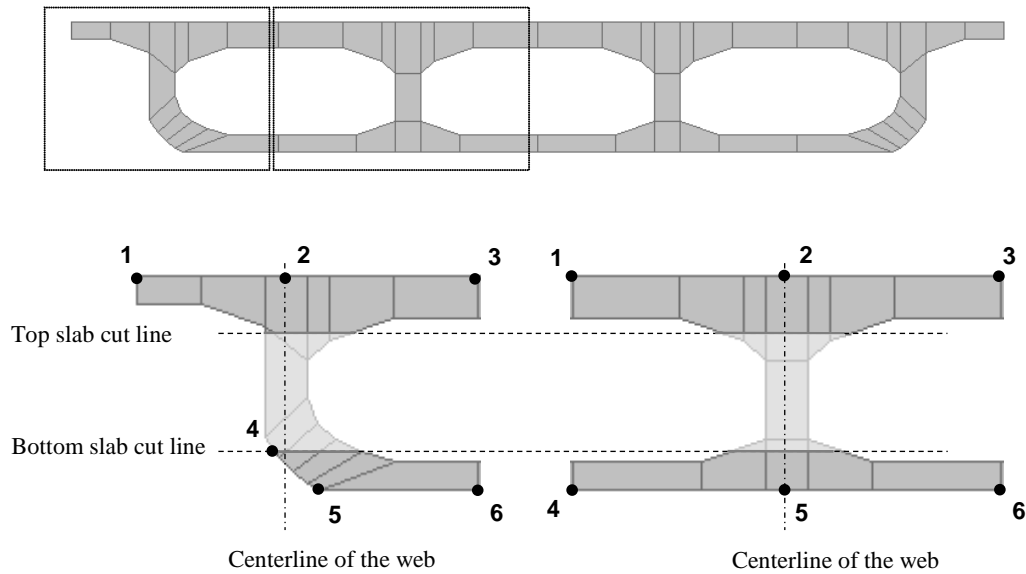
Bridge Concrete Box Deck Section - Advanced
